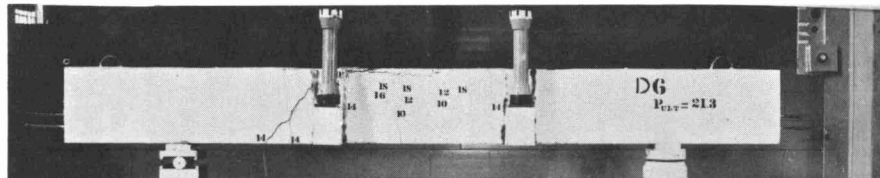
Rectangular Beams with 30 in. Shear Spans
